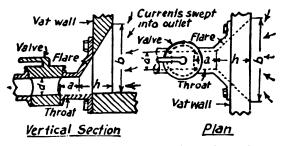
Close coupled side outlet valve connected to holder, showing design requirements. d=diameter of outlet.
